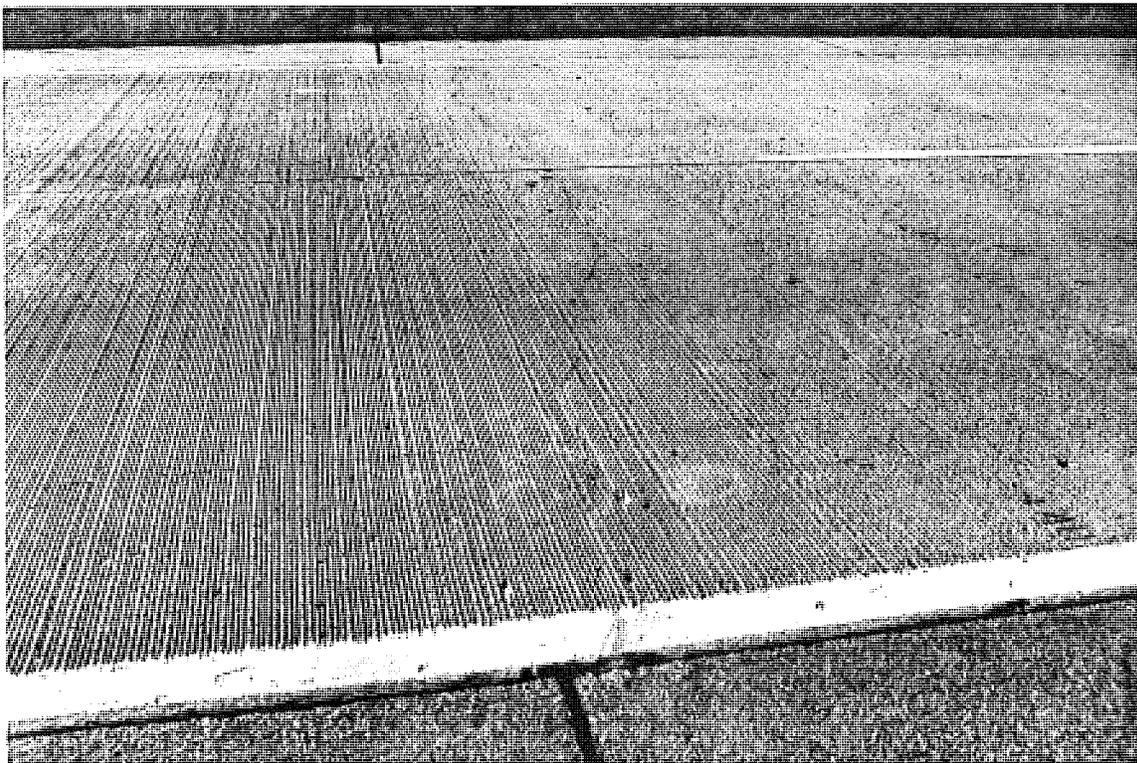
A typical full width mid slab crack on CSN# 19043-02234A, WB. This crack was initiated by the third point intermediate shoulder joint seen at the bottom of the photo.
